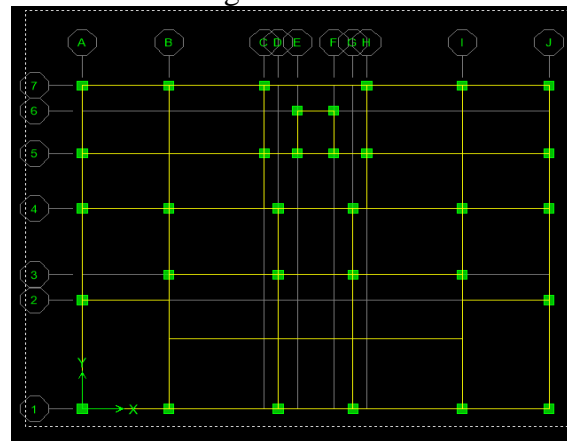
Columns from story 13 to story 17 for Plan of a building
